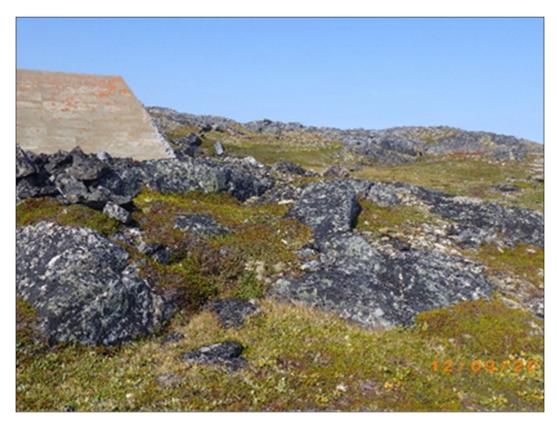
APEC #1: View of concrete berm looking uphill; bedrock outcrops are evident throughout the area. (September, 2017)
